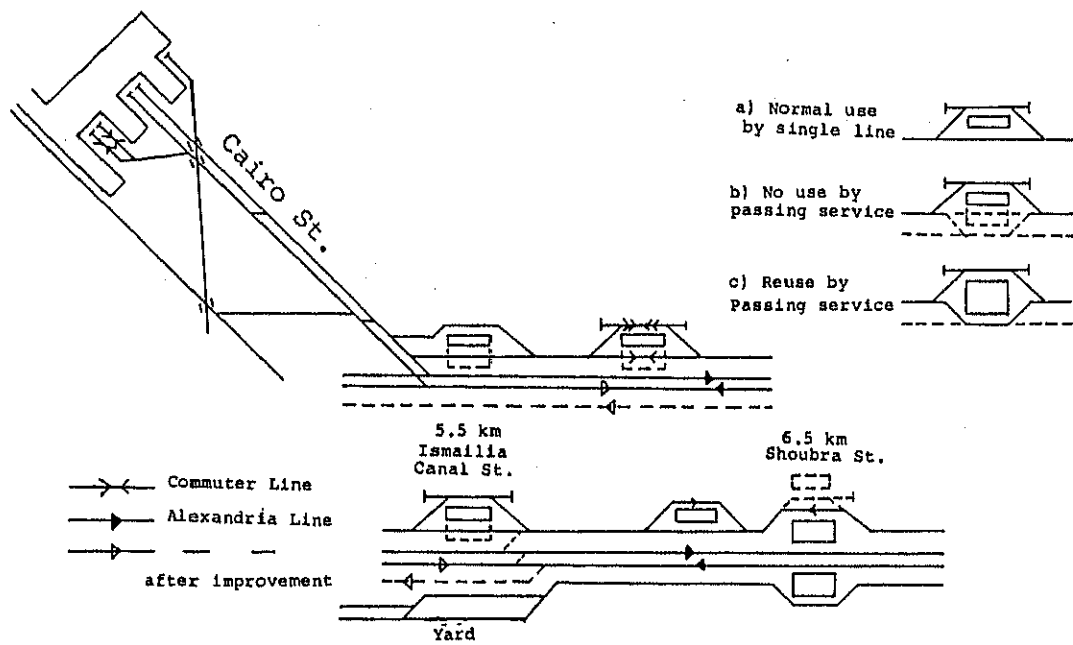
Track Layout Plan for Single Track Operation
